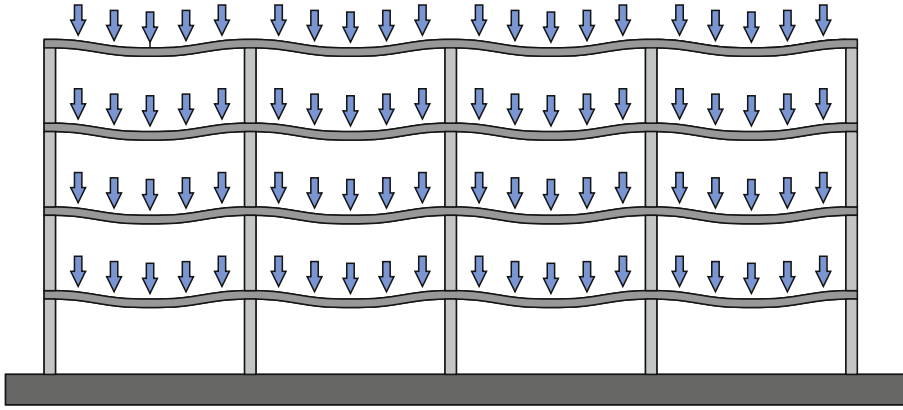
Scheme of a typical flat slab structure under vertical loading.
